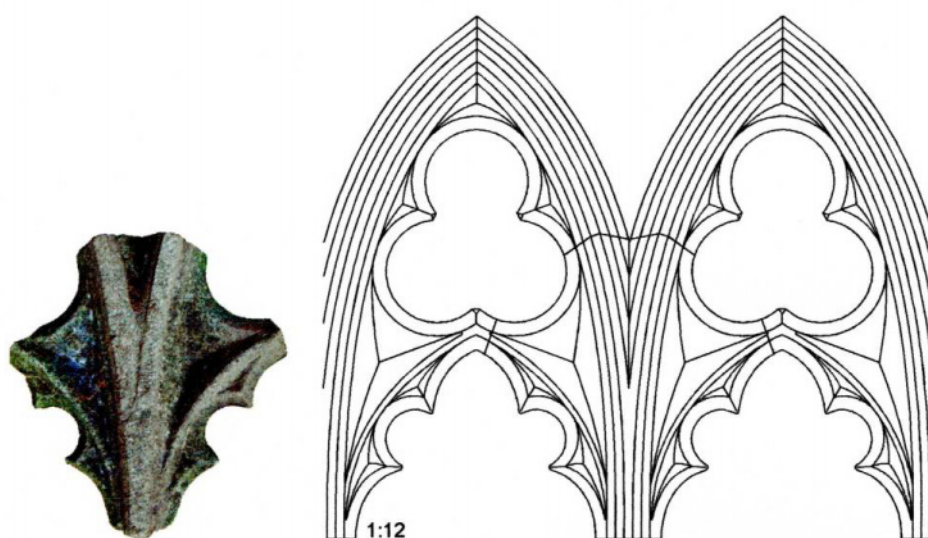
Launceston Priory: tracery fragment with proposed reconstruction
